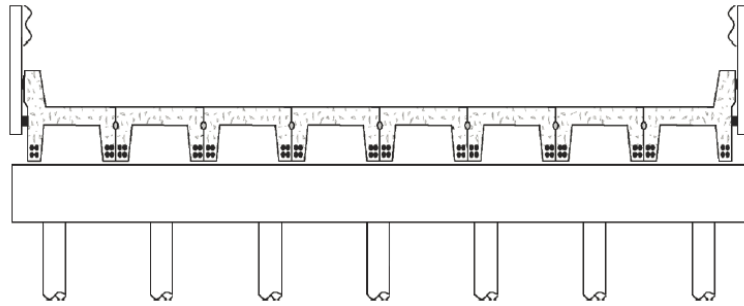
Typical Channel Bridge Cross Section (Wipf 2006)
